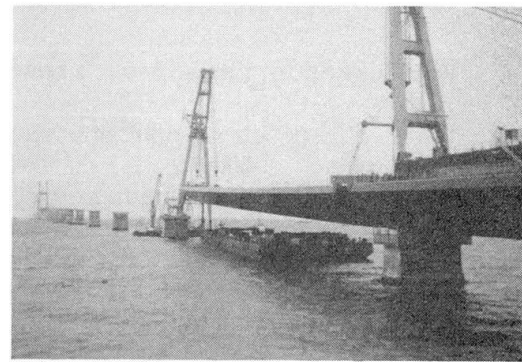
4 - Approach spans: Lifting, front end lowering, typical span erection phases
